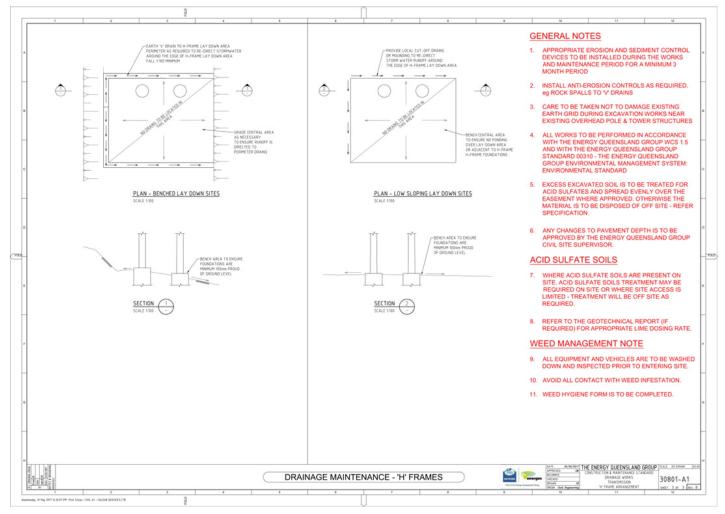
Drainage Maintenance - 'H' Frame Structure
